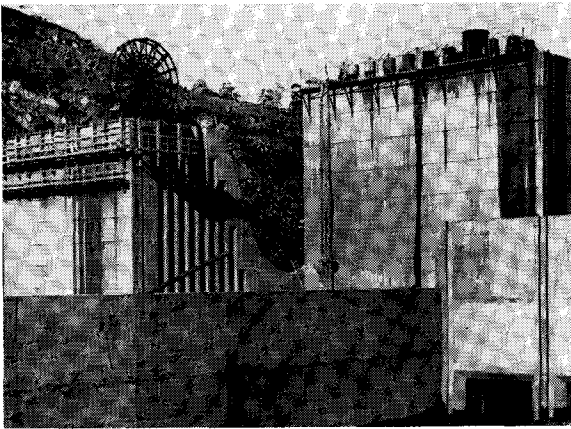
Catagunya Dam—Cable Heads and Homing Wheel
